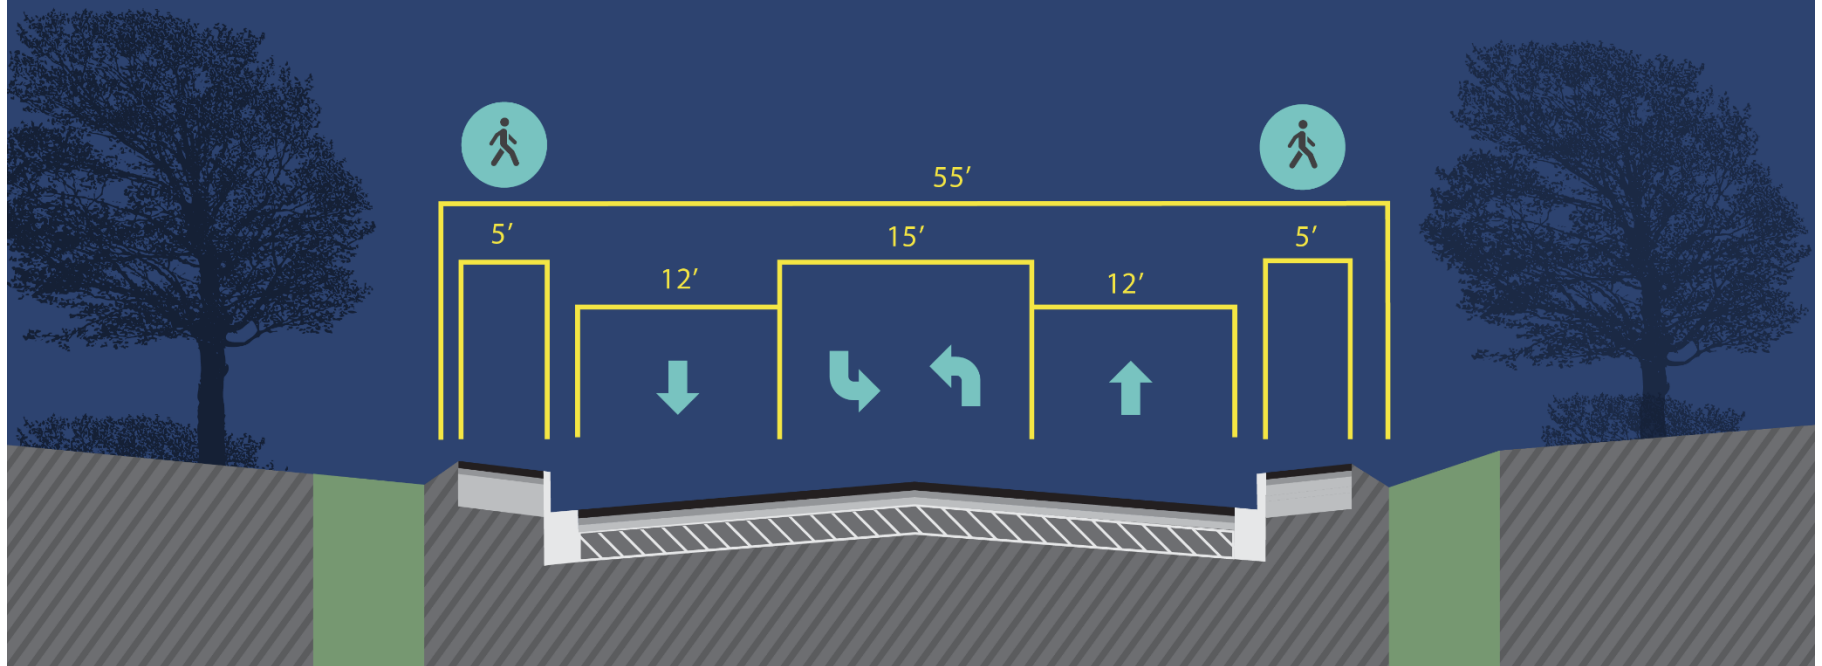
SC 41 Proposed Typical Section between Joe Rouse Road and Dunes West Boulevard
